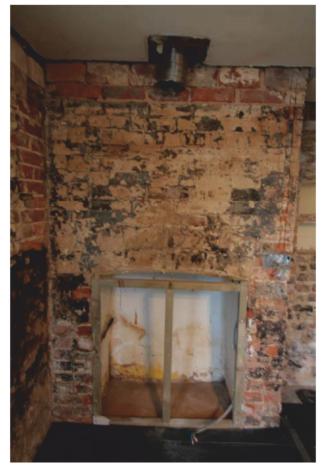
Fireplace in west wall of Kitchen, looking west (D3 029)
